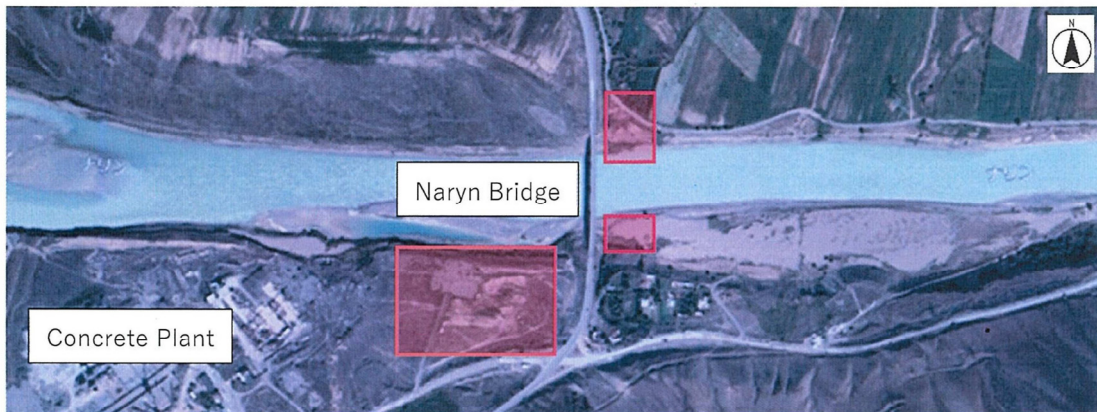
Possible Location of Land for Site Office, Plant Yards, Material Storing Yards, Temporary Construction Yard
